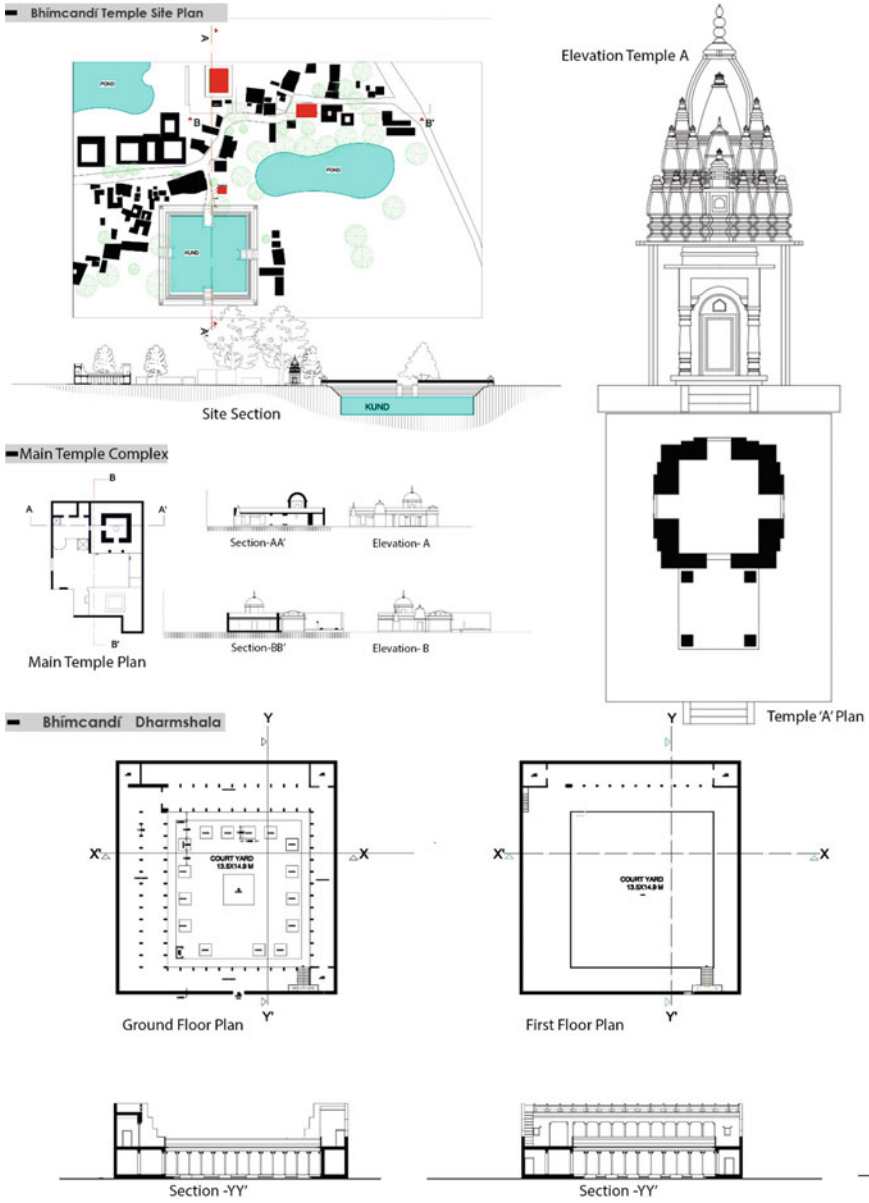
Bhimacandi Parāv: Plan, section, elevation. Picture credit: Vandana Sehgal
